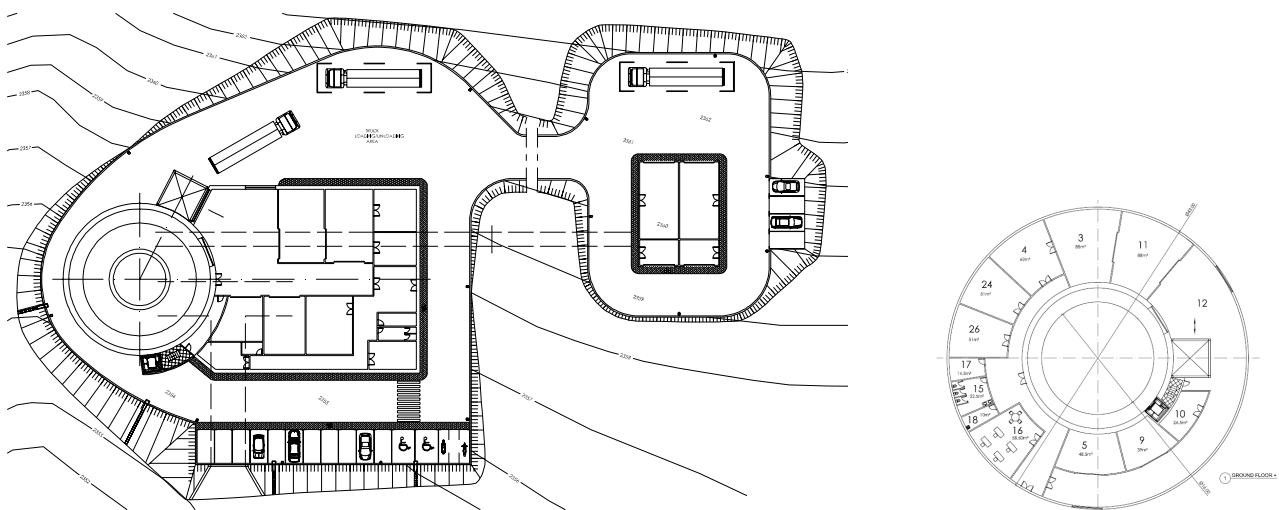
(Left) Conceptual building layout for EST with rectangular building; (Right) layout for round building.
